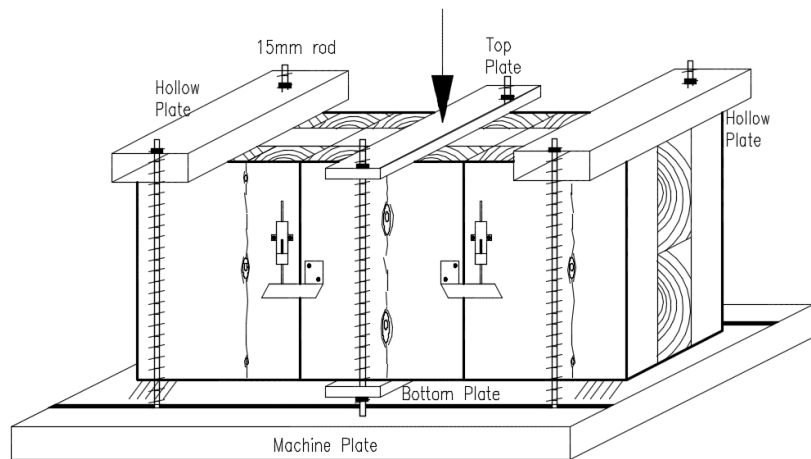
Test setup for Mini sized specimens under cyclic loading
